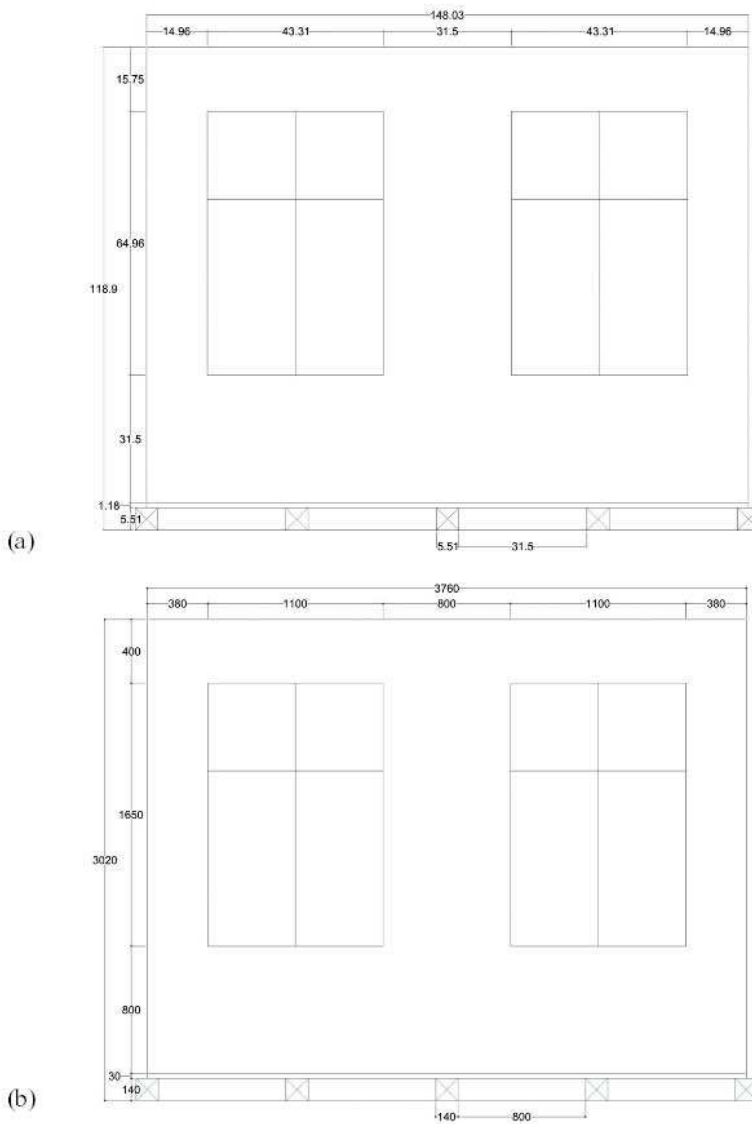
Section of a typical outer wall with wooden floor beams from 1850–1950 in (a) I-P units and (b) SI units.
